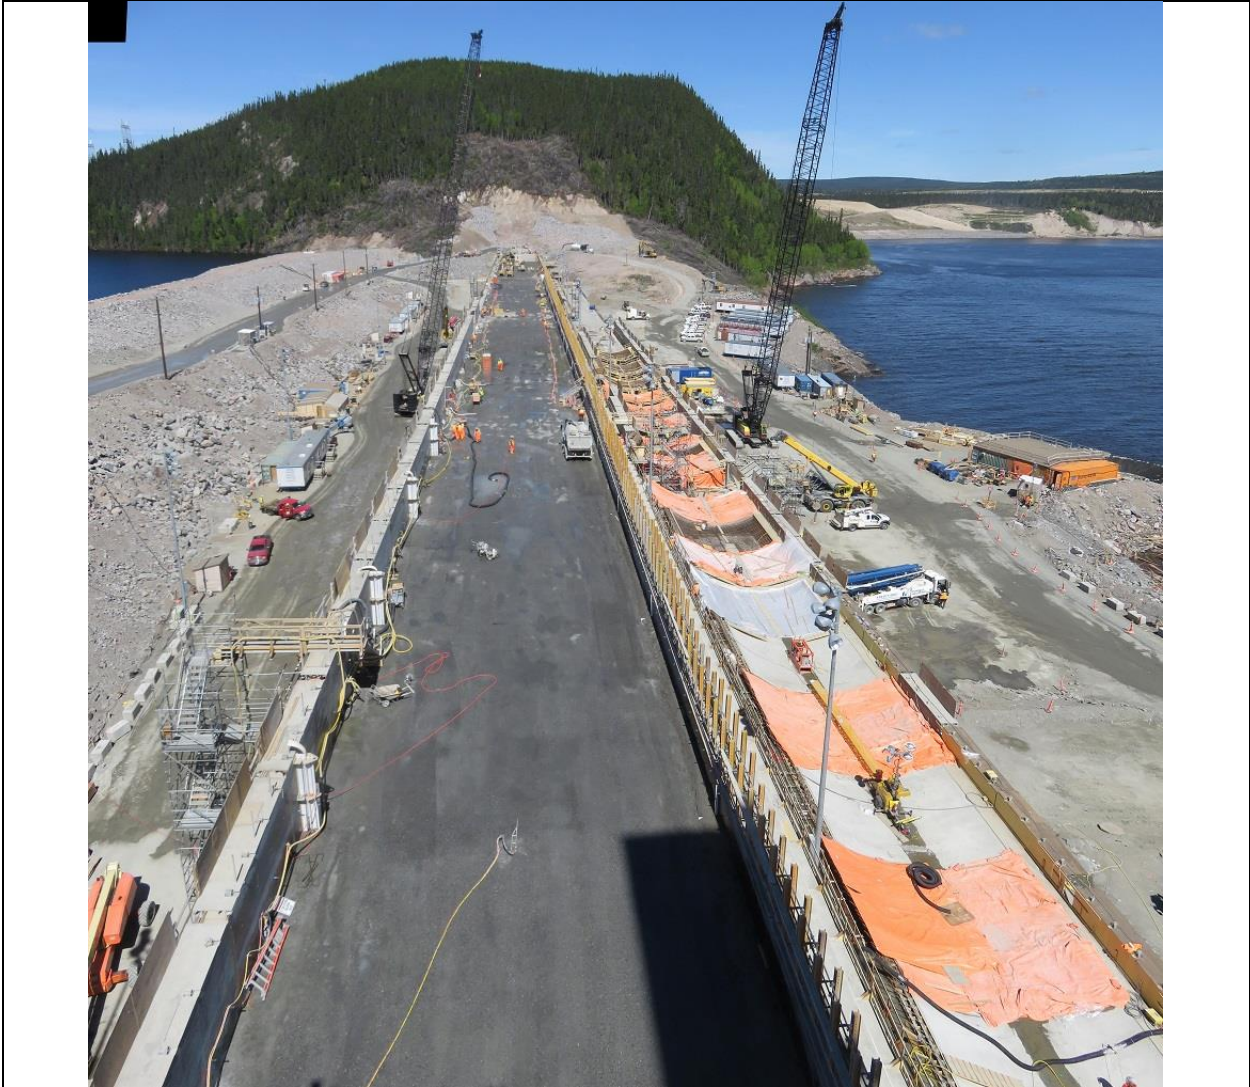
View from north transition dam looking northerly along top of RCC dam. Spillway flip bucket, being constructed with conventional cast-in-place concrete, is along right (downstream) side; upstream cofferdam is to left.
